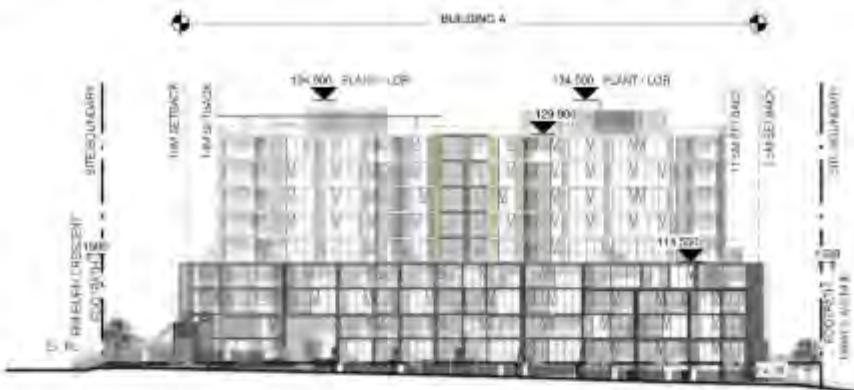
Western Elevation – Middleton Avenue (Source: PTW Architects, 2019)
